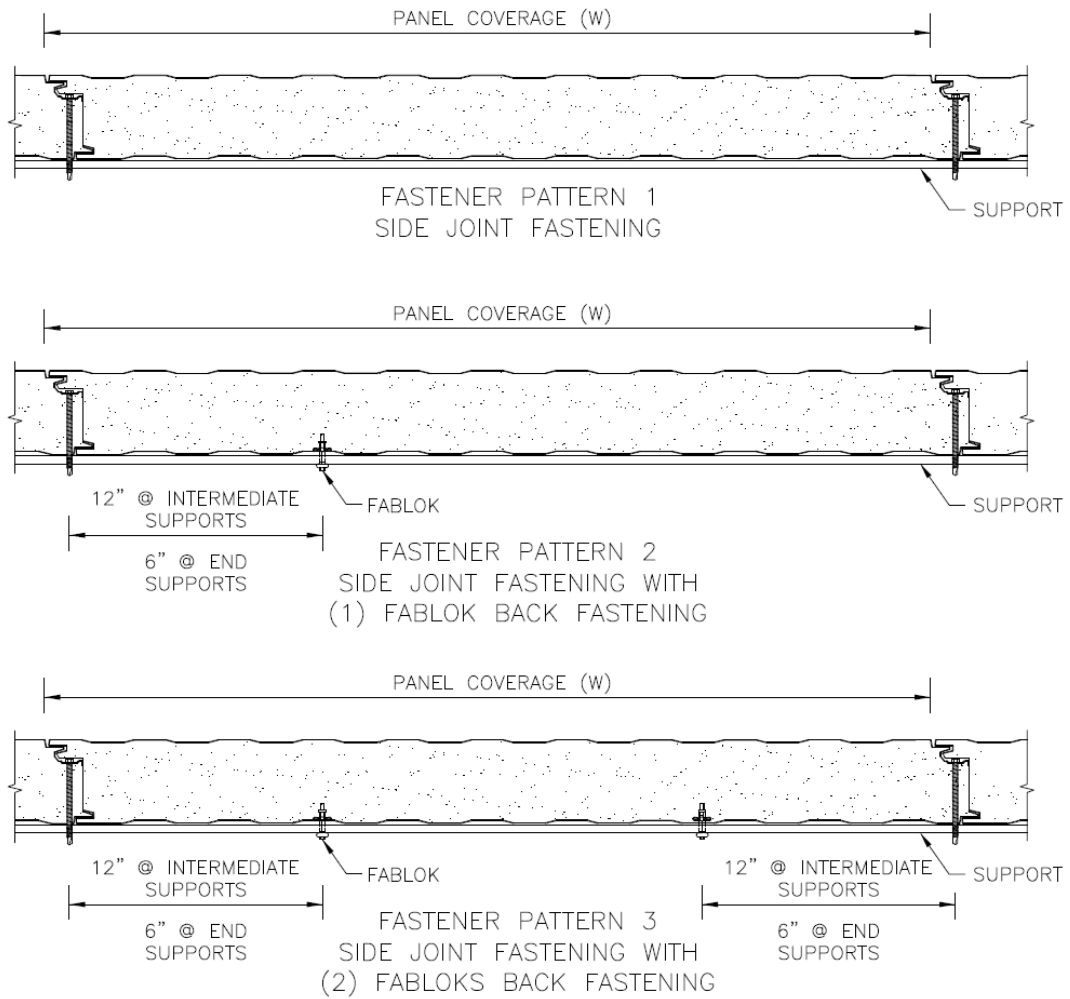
FASTENING PATTERNS FOR CF PANELS
